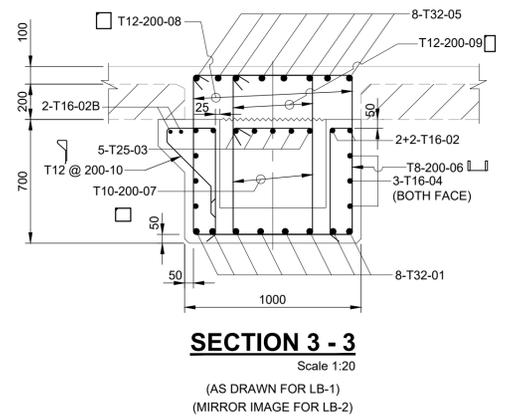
DETAILS OF LONGITUDINAL BEAM LB-1 & LB-2
